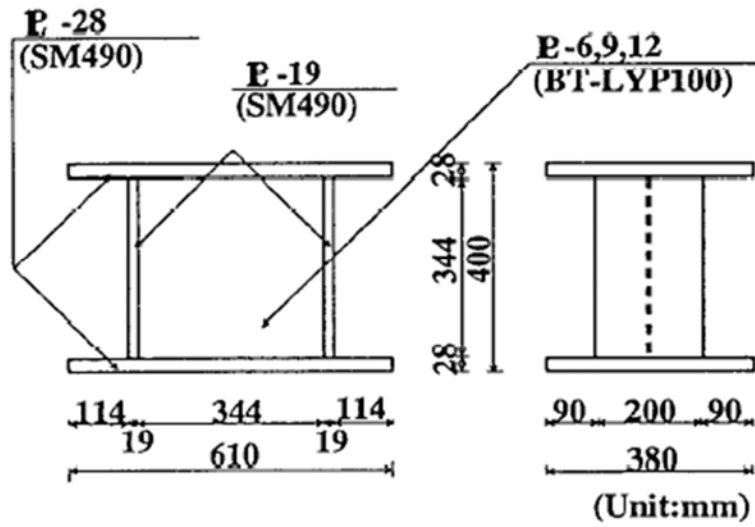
Shear Panel Links Details And Dimensions Of Test Specimens (Nakashima M.,1995)
